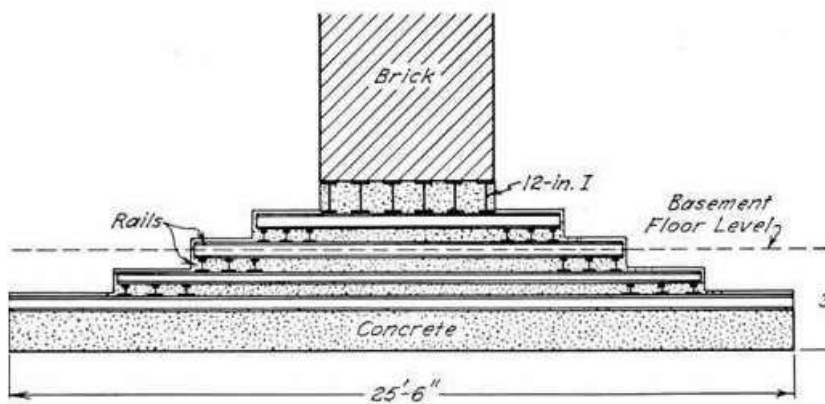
SECTION THROUGH RAIL-GRILLAGE FOOTING OF MONADNOCK BLOCK
